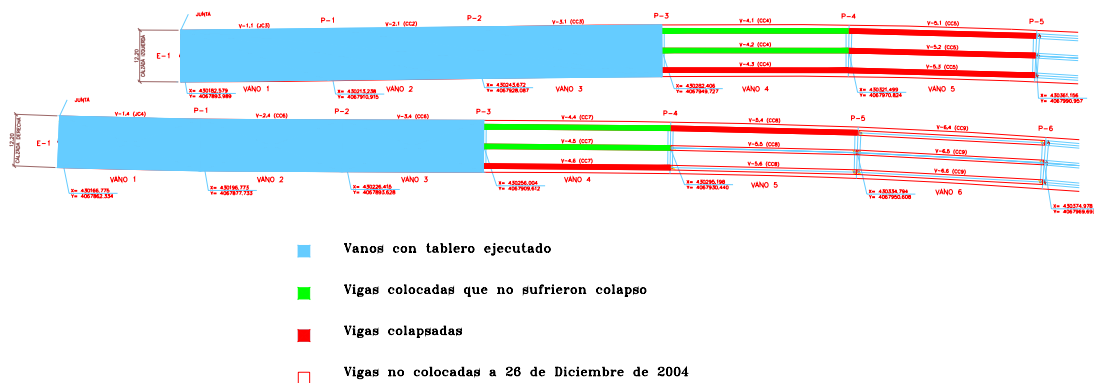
Plan layout of both the collapsed beams, as well as of the weather-resisting beams with the constructed slab over them.
